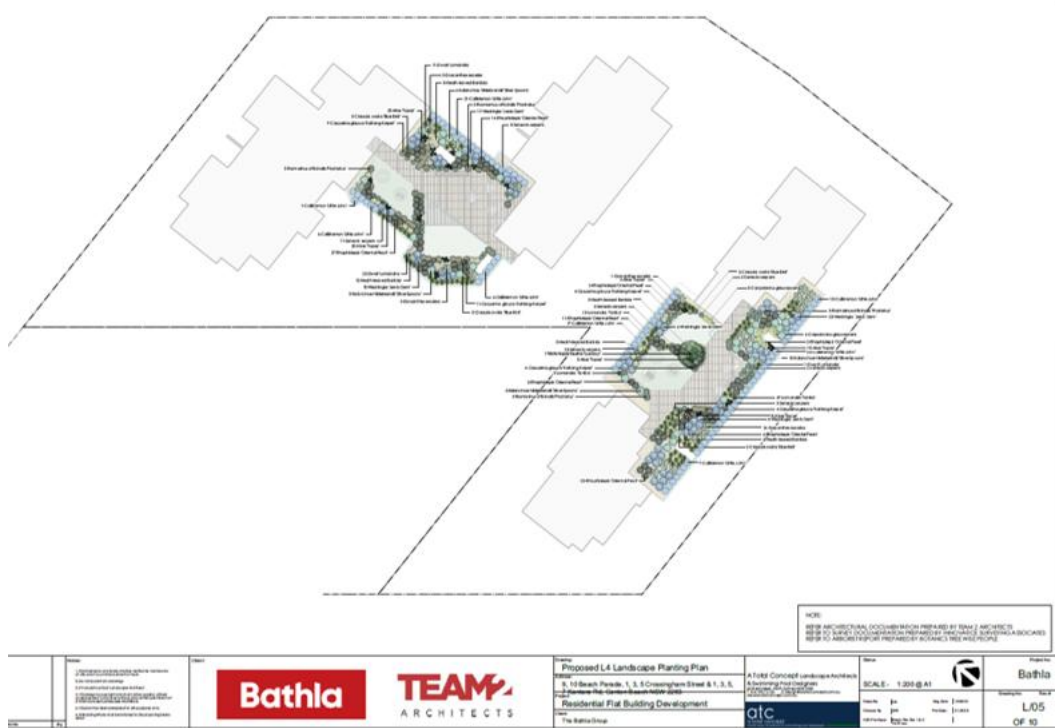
Team 2 Architects Proposed level 4 landscape planting
